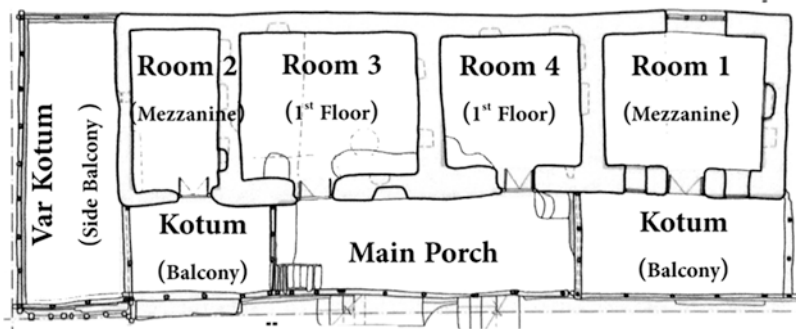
Mohtashemi Talab house, closed spaces layout in first floor (Taleghani 2010b)
